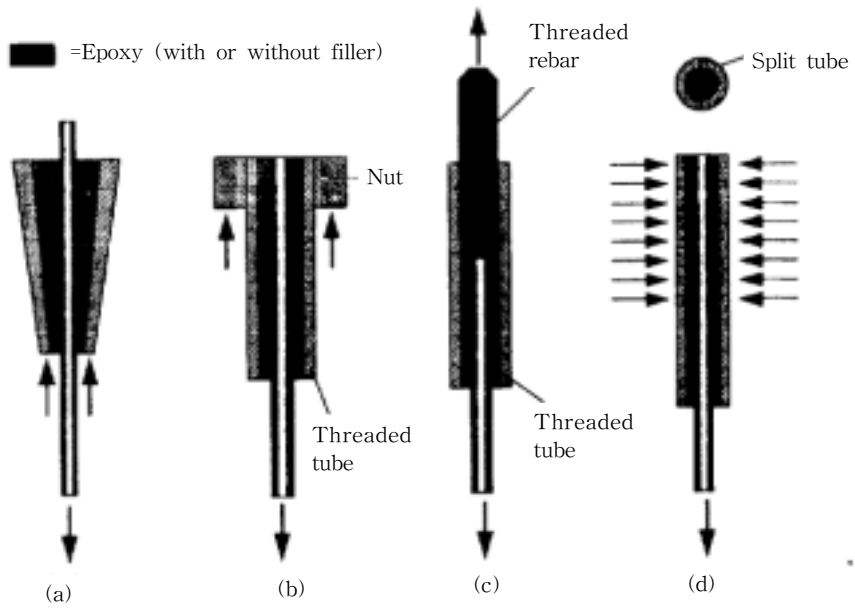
Anchorage systems used for tensile test of FPR rebar^{27,71,148)}
